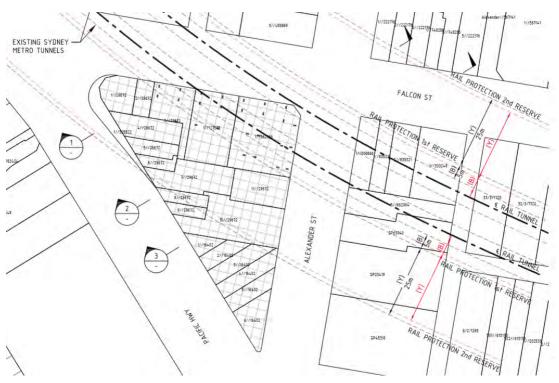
Metro tunnel easements affecting the site. (Source BG&E)
